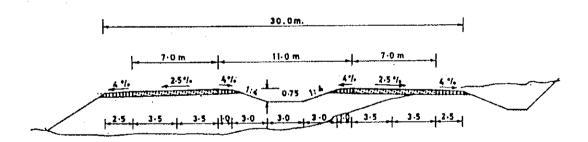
Cross Section Type I-Dual Carriage Way
